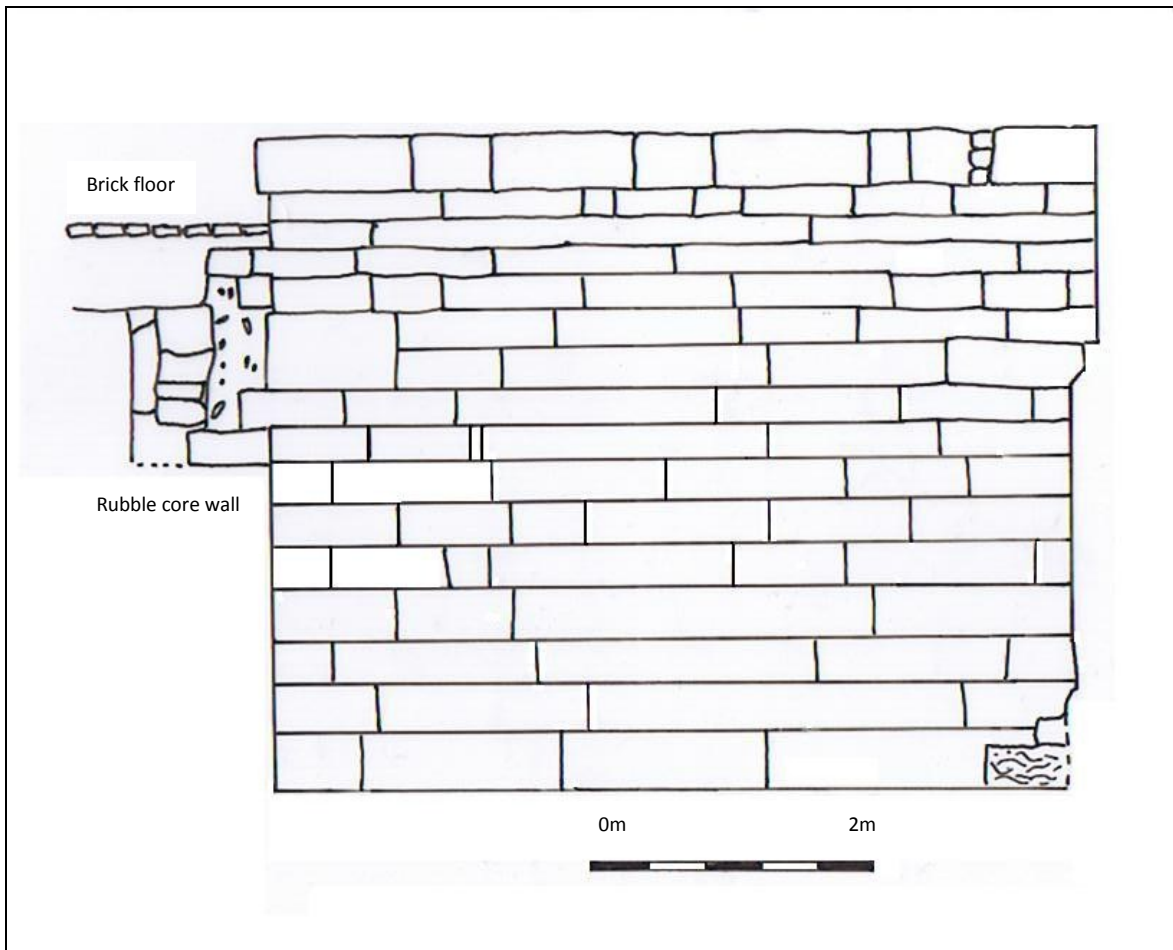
Eastern stone elevation 3 belonging to the wheel-pit
